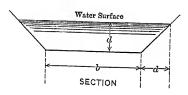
(Part 2 of 3).—Hydraulic Elements of Trapezoidal Sections.
